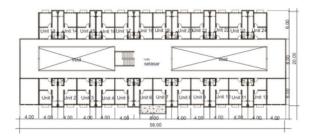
Floor plans 2,3,4,5 Flats Penjaringan Sari III
